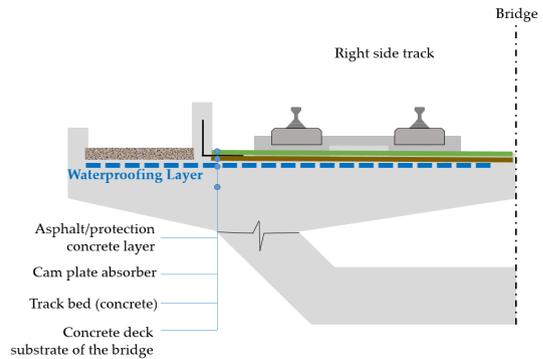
Sample PSC track bed structure design layout with waterproofing system
